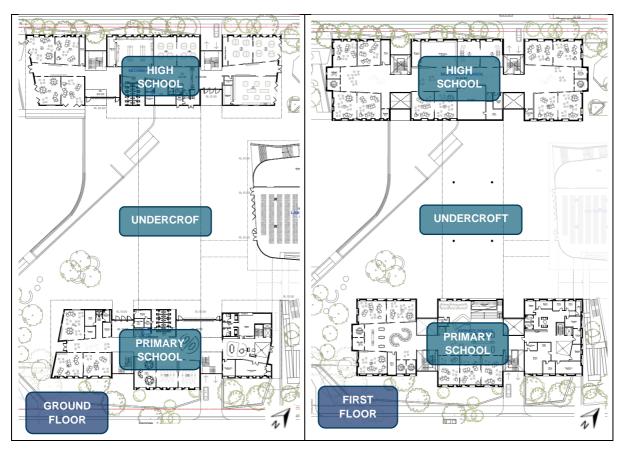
| Ground and first floor plans (Source: Applicant's RtS 2020)
